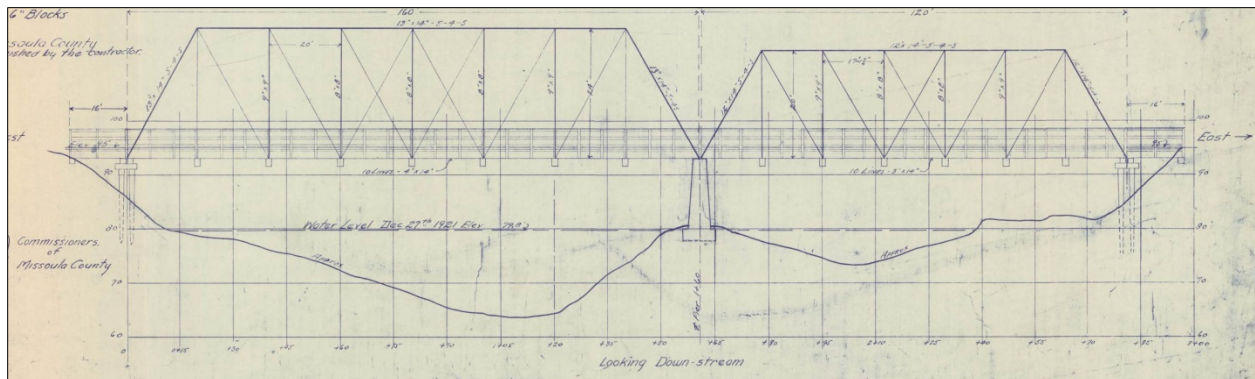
1922 plans of replacement bridge. Note the two steel-Pratt-through trusses.
